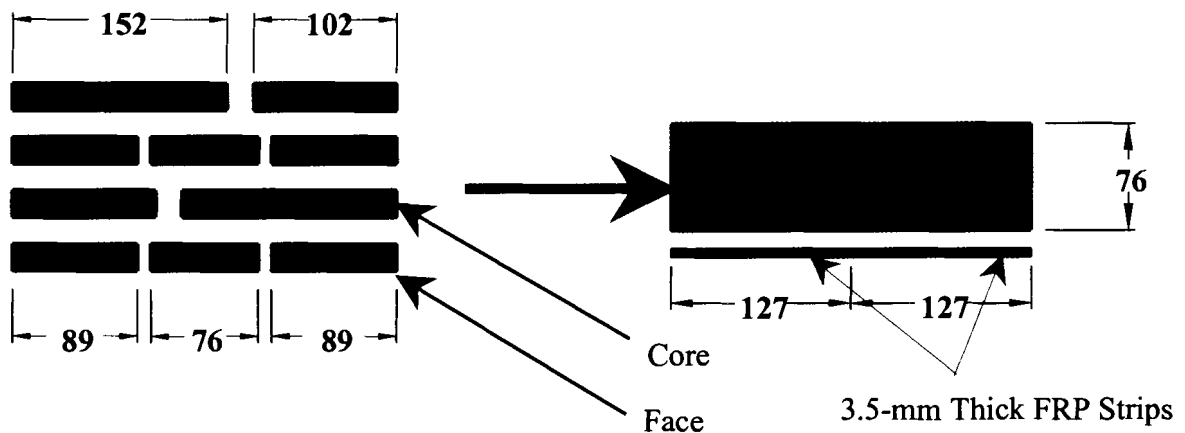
Glulam Brickwork Layout (all dimensions in mm)
